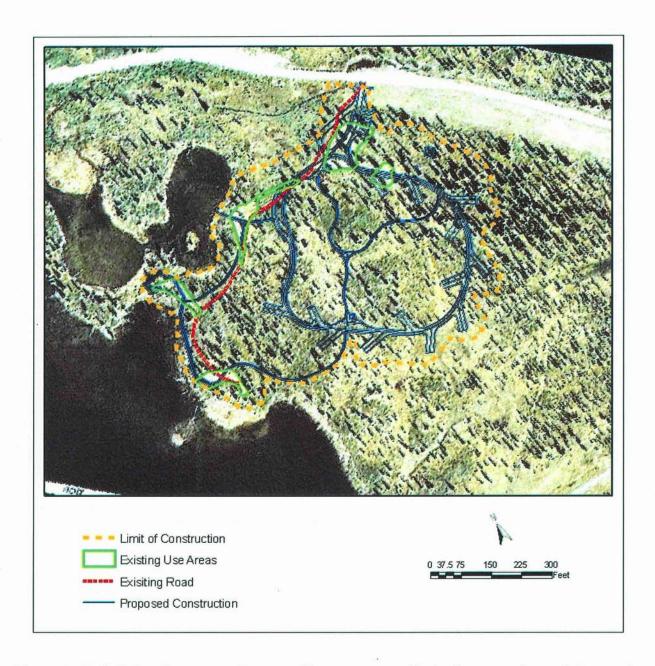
Twin Lakes Campground proposed improvements, limit of construction, existing road and campsites.
